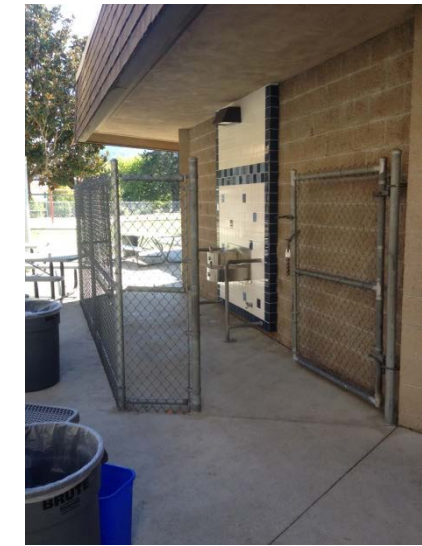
Kindergarten and lunch outdoor shelter corridor presents a circulation pinch point.
